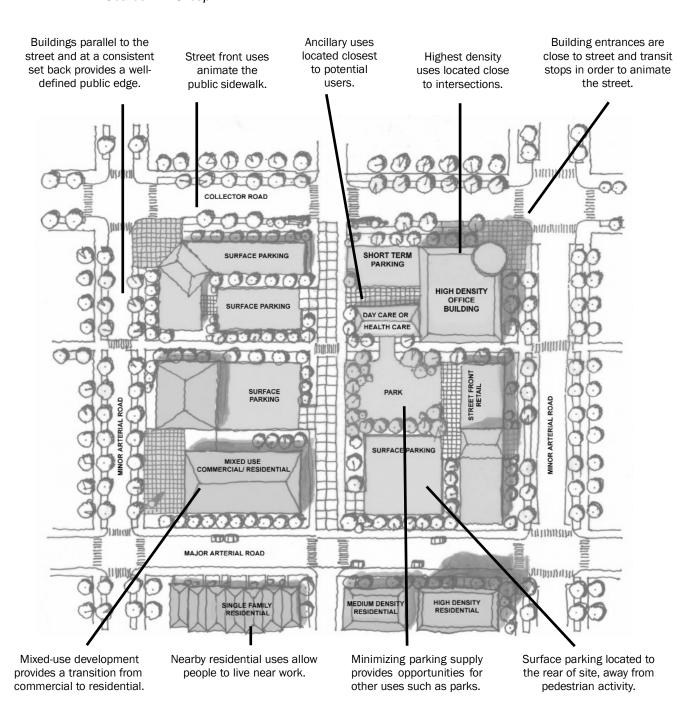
Site Layout Design Elements on a Typical Site
